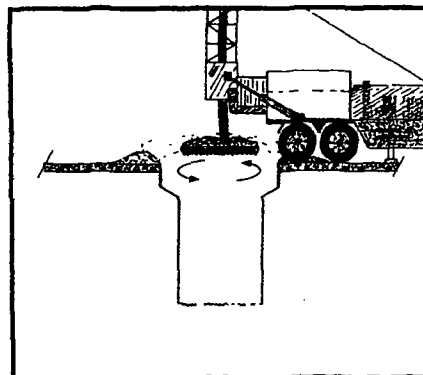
Auger Drill Rig, Greater Confinement Disposal Test. Source: Reynolds Electrical and Engineering Co., "Greater Confinement Disposal Test at the Nevada Test Site, June 1983," DOE/NV/00410-79.
